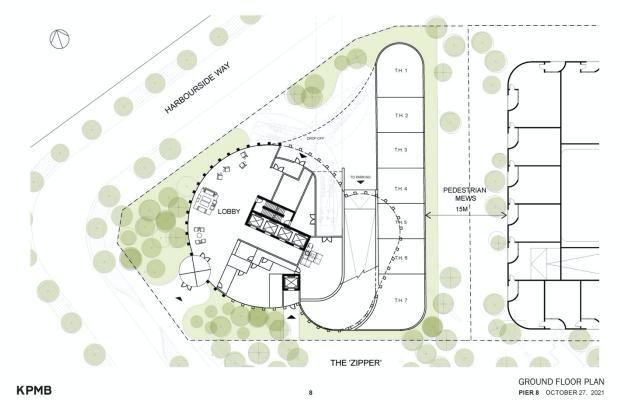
Proposed Ground Floor Plan (KPMB Architects)
